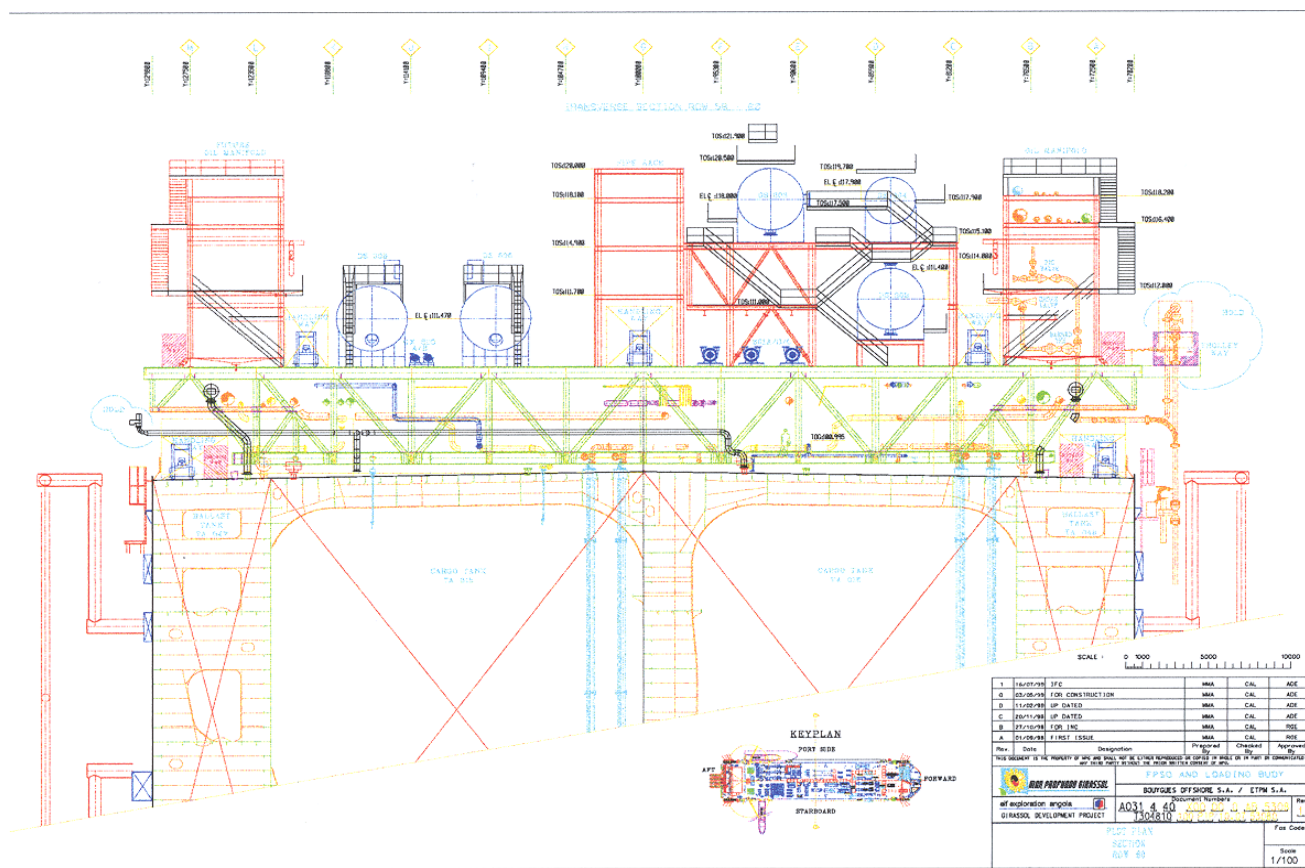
Layout drawing (Plot Plan) of the Girassol separators and desalters
